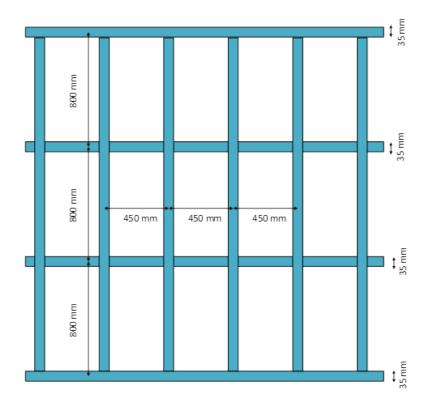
LWDF STEEL FRAME WALL ELEVATION PROFILE
